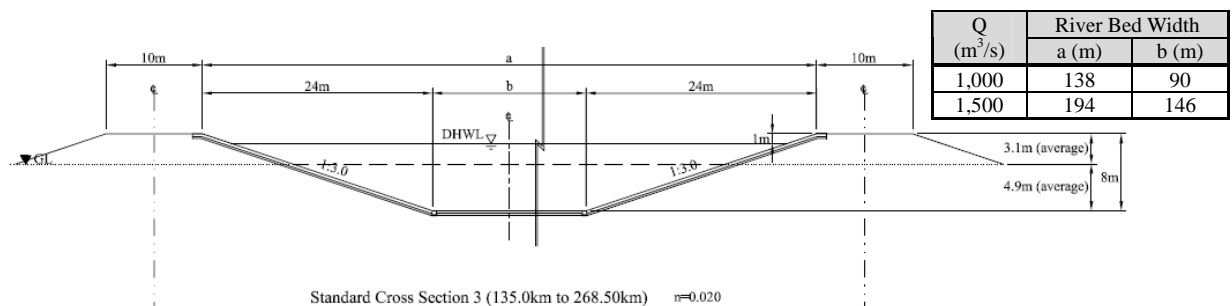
Alternative Cross Section of East Diversion Channel with Slope and Riverbed Protection (135km to Diversion Point)
